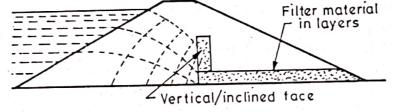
(d). 'Chimney Drain' in Stratified Embankments.
